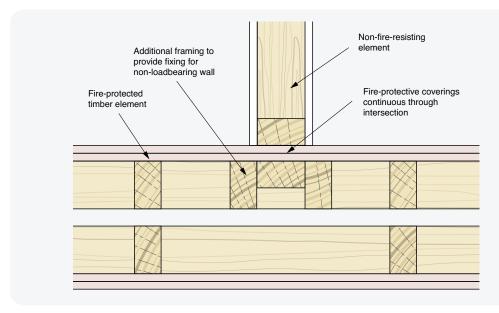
Junction of non-fire-resistant wall with fire-protected timber wall including additional framing detail.
